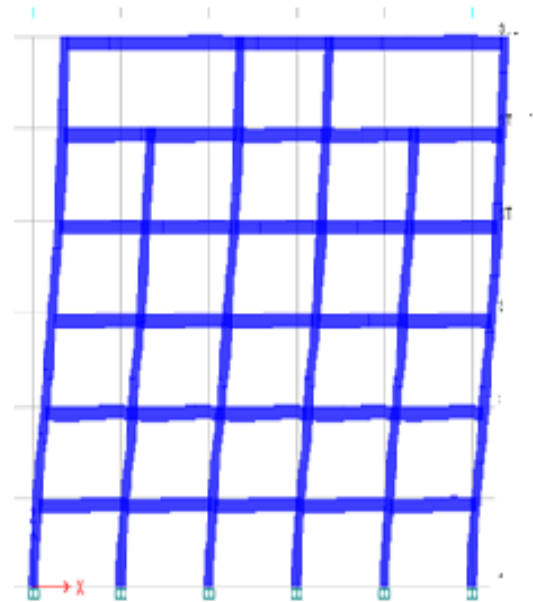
Deformed shape of building with FC at 4th parallel position
